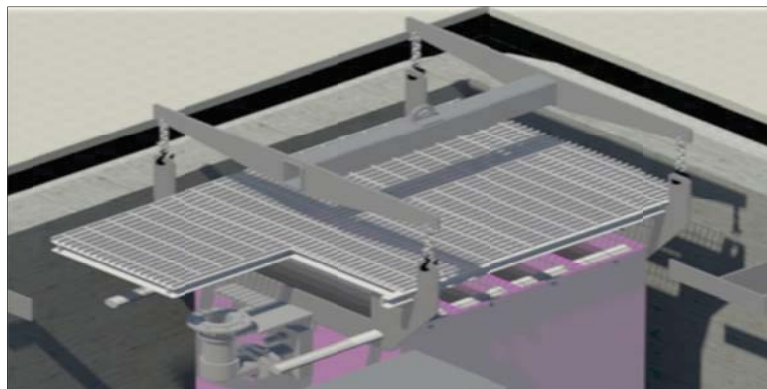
Proper attachment location and lifting technique for transportation with a crane and Lifting Tool.
